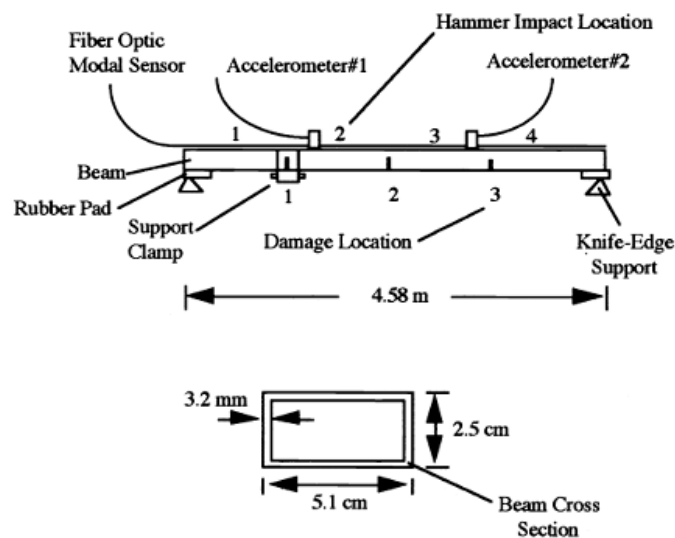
Model bridge girder details (Spillman and Williams, 1993).
